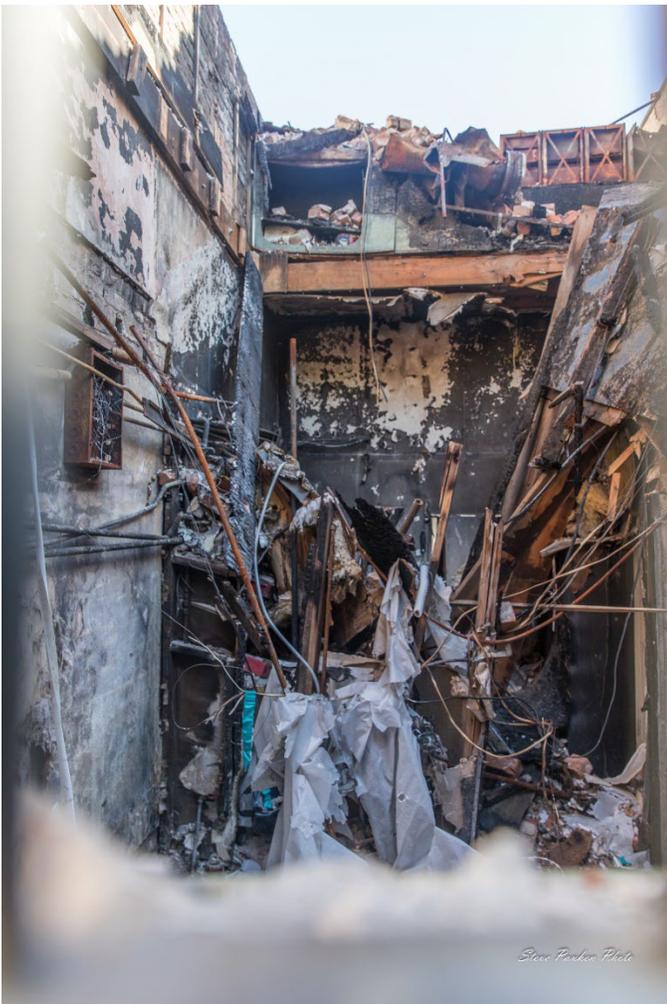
Interior fire damage to the rear of 30 Main Street; view facing north.
